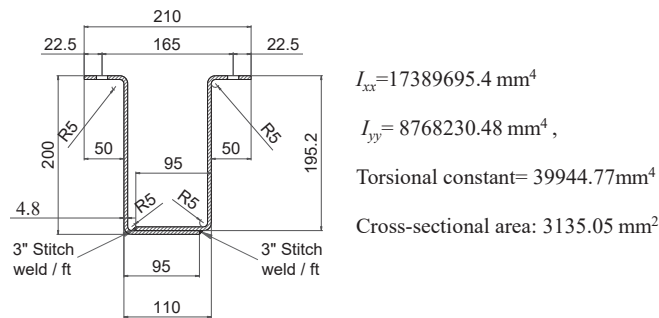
Steel beam cross section dimension (dimensions in mm except stated otherwise)
